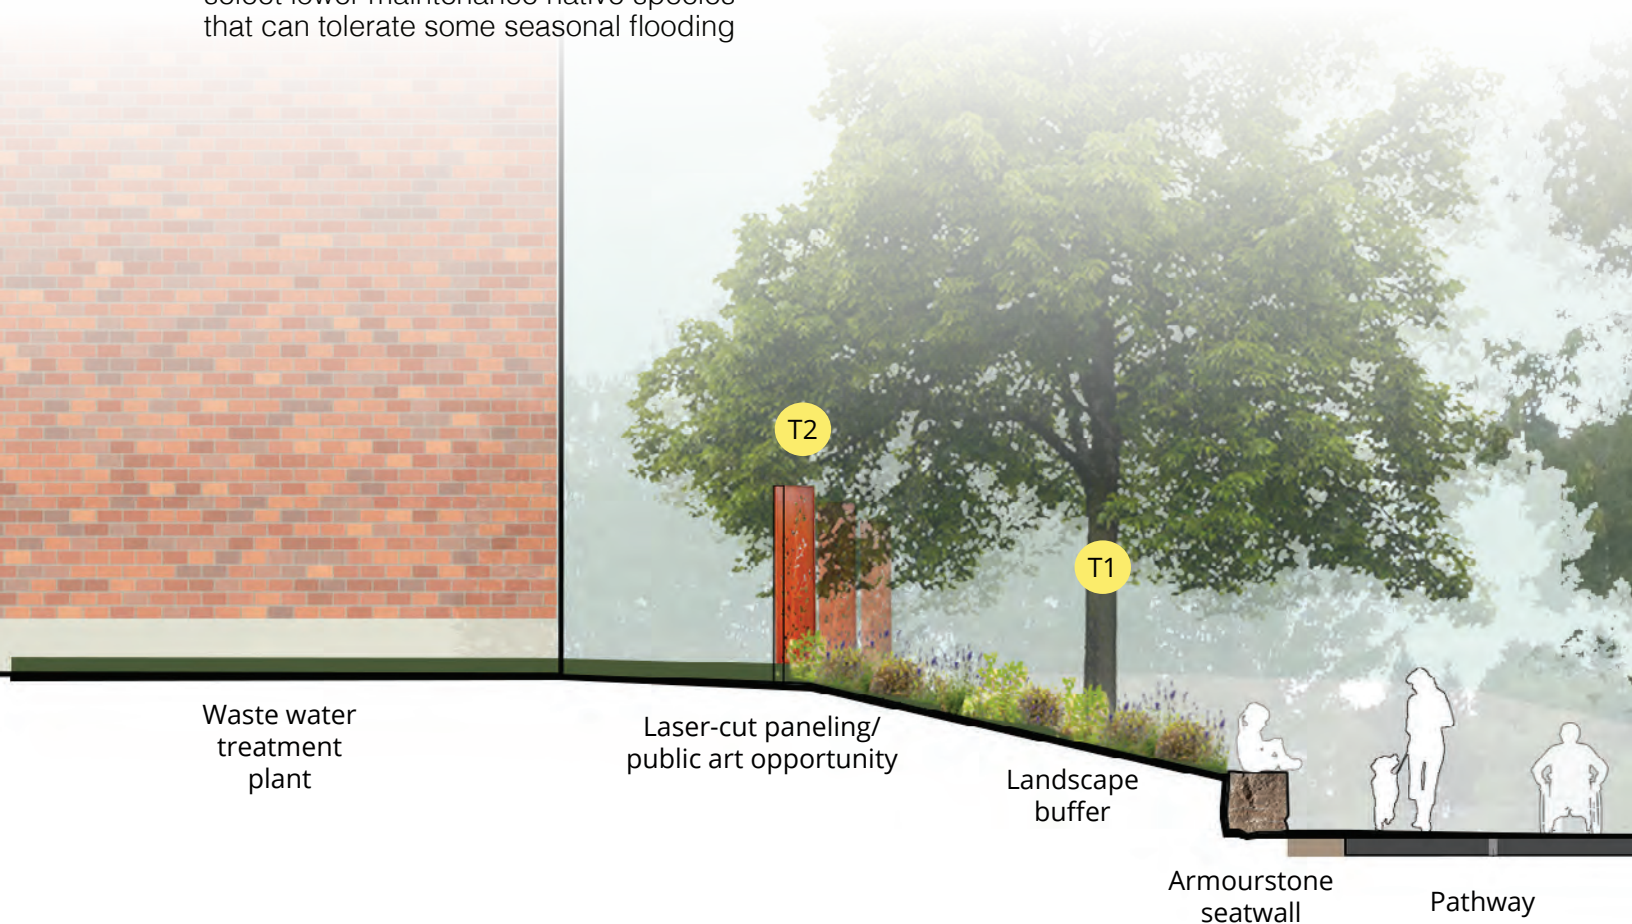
Treatment Plant and Fishing Dock Elevation
